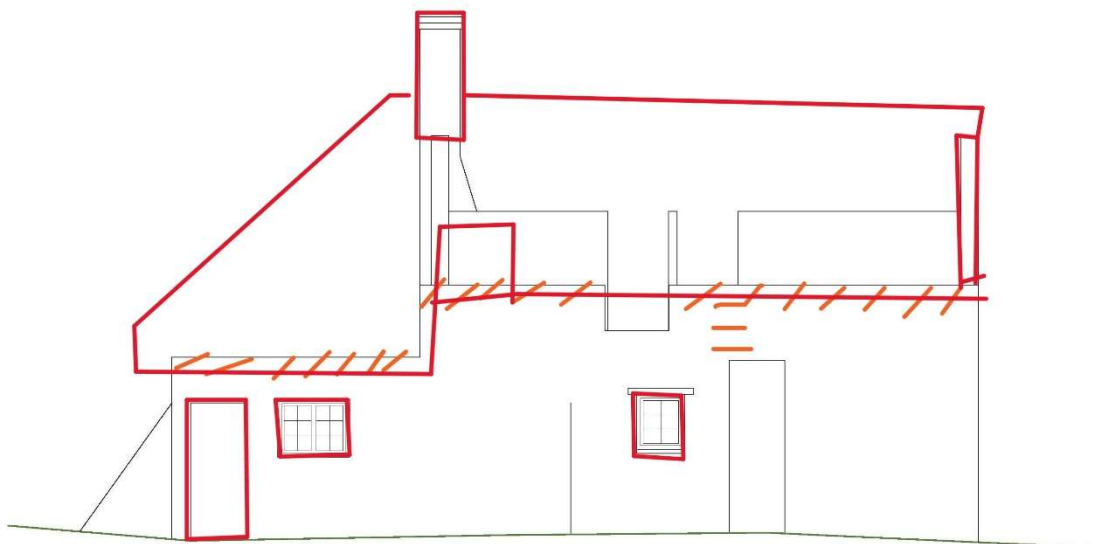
Existing South Elevation – repair (orange) or reinstate to replicate pre-fire (red)
